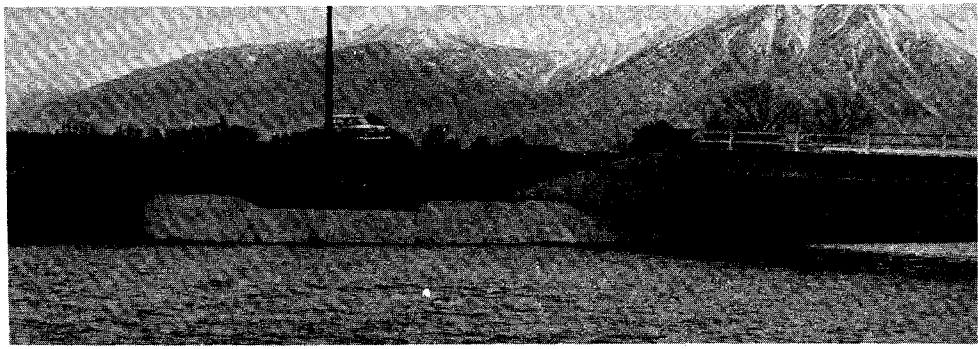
Slope paving on left bank at upstream side of bridge on May 8, 1957. (From Nevada Dept. of Highways.)
